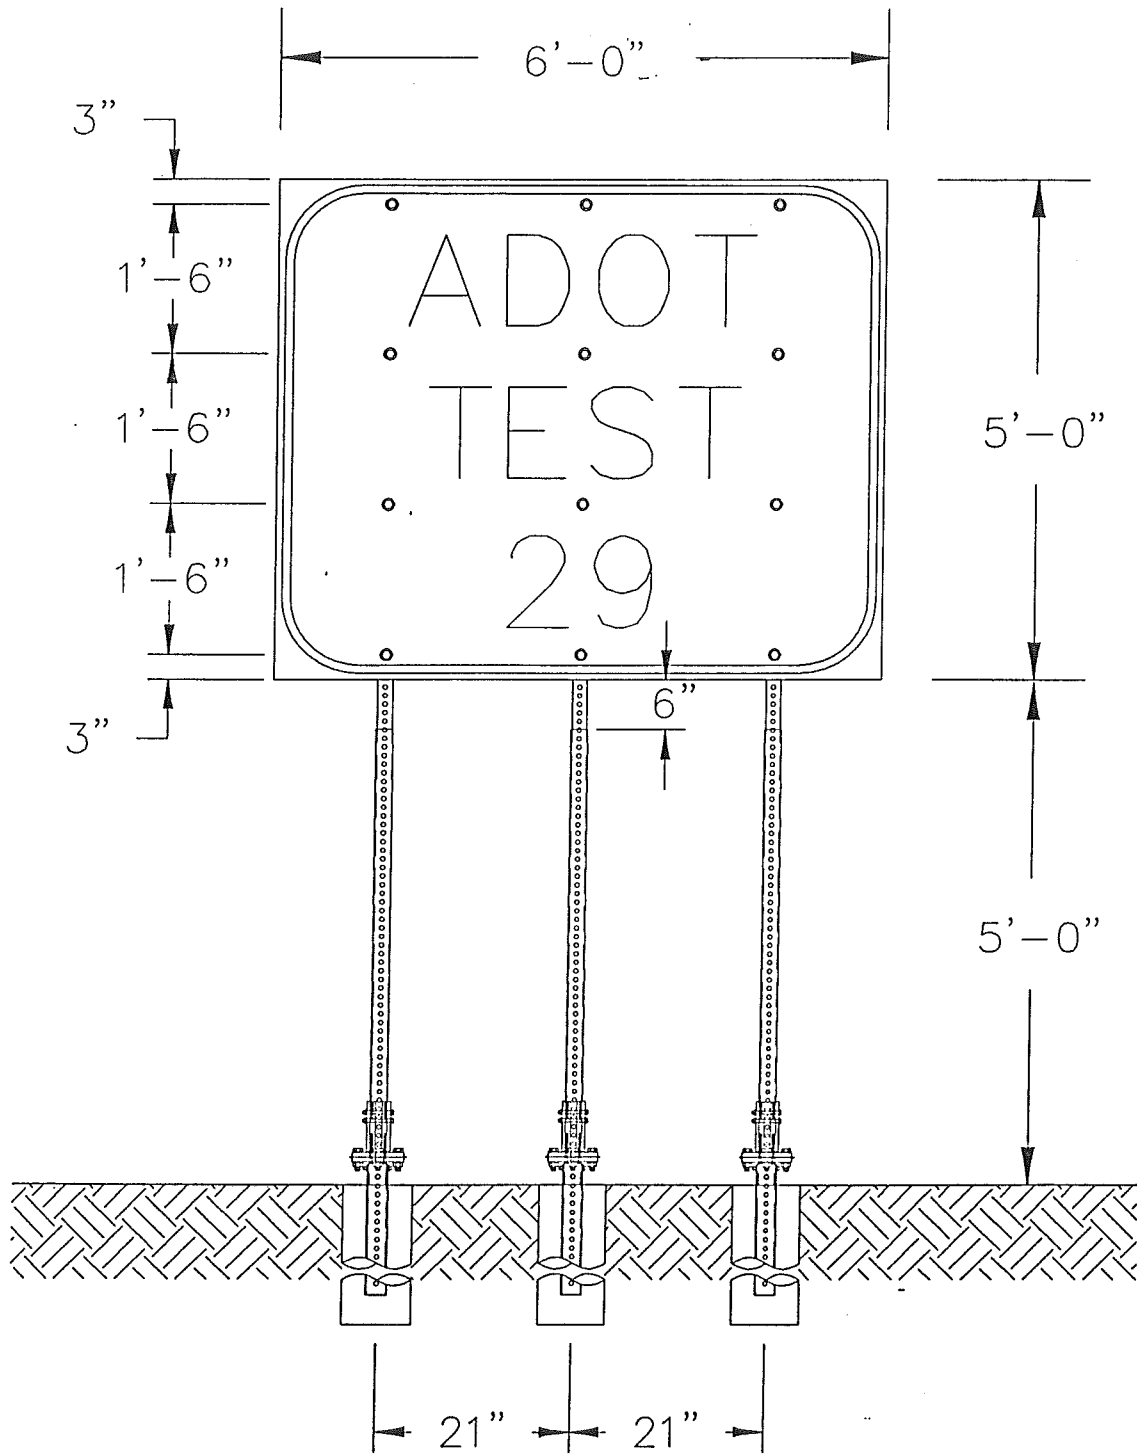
B. DETAILS OF SIGN INSTALLATION FOR TEST 7024-29 AND 7024-30
